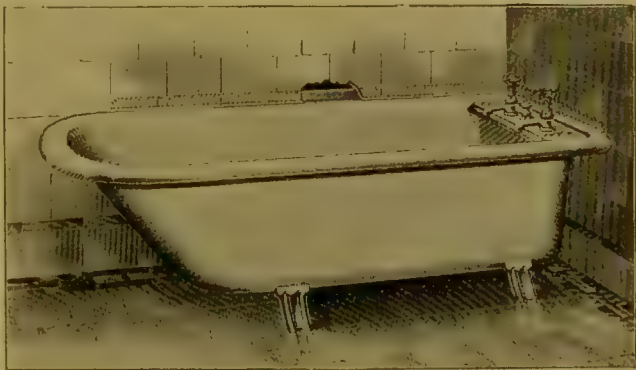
shows a Modern Bath placed in position in a Bathroom in accordance with modern requirements, viz. :—Standing clear of walls and floor, and without surrounding wood-work.
